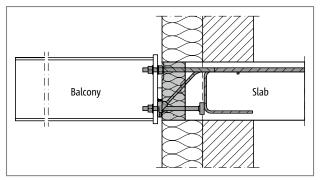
Schöck Isokorb® T type SK: With the aid of the floor extension, the insulating element ends flush with the wall insulation; the spacing at the edges must be taken into consideration.
